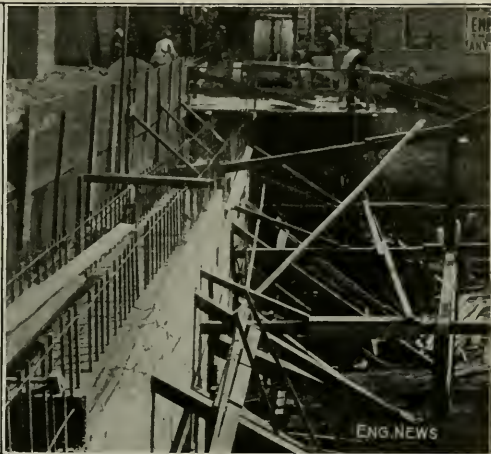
CONCRETE RETAINING-WALL WITH TIMBER SHORING
